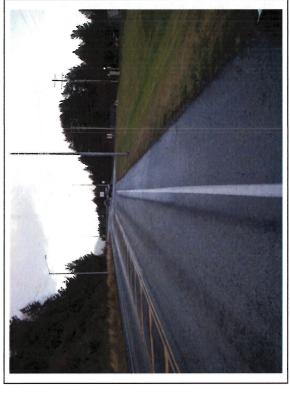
Looking north along Rezanof from SP#10 toward runway area to right of photo Near KOD -1048, 691, 764.
